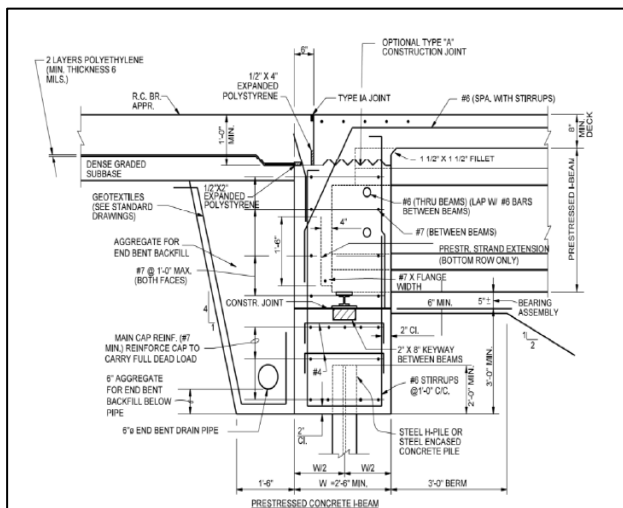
Typical Abutment Detail B (Frosch & Lovell, 2011)
